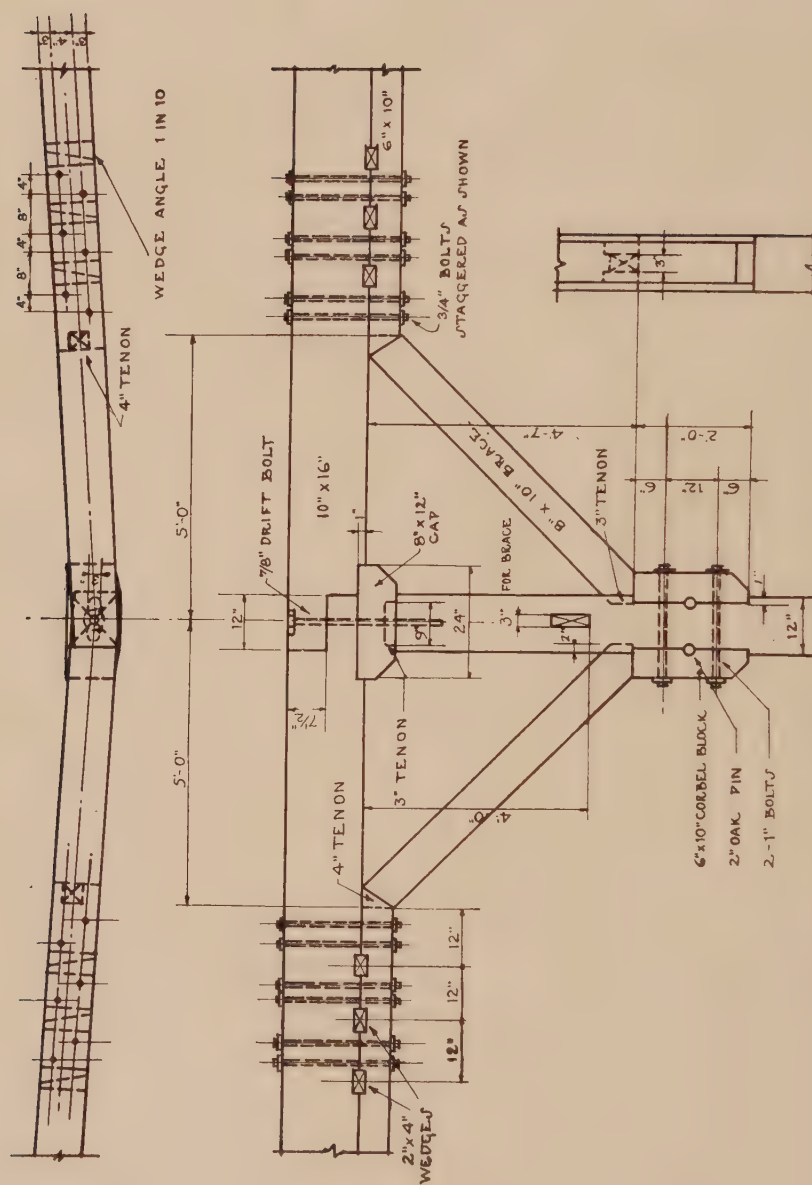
Plan and elevation of a method of providing support for heavy roof beams.
